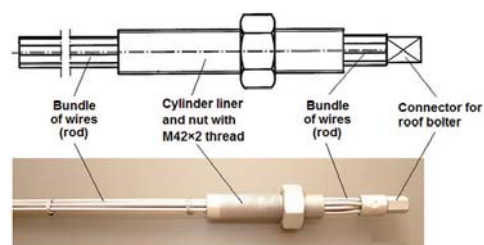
Mechanical construction scheme and photograph of yielding bolt (www.interram.pl)
